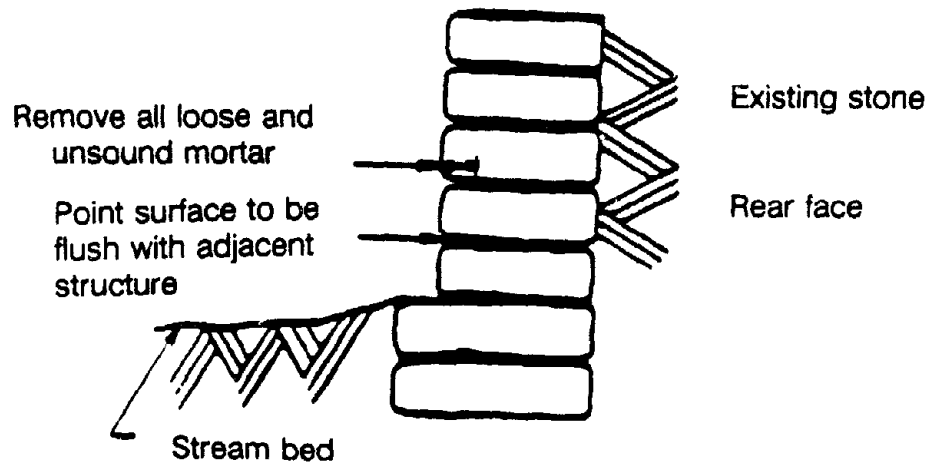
Details for repointing masonry.⁽¹⁾ (adapted)
